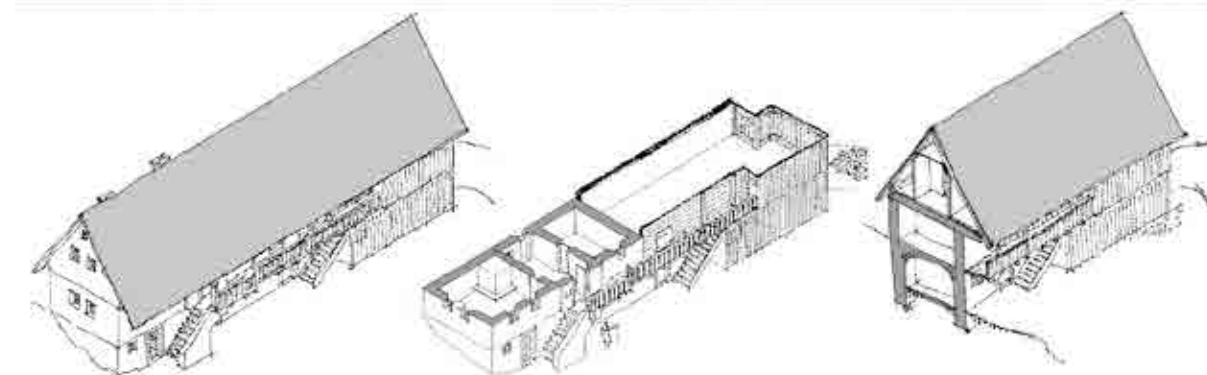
A house can be presented in a photo as we see it, but only technical drawings with exact dimensions can bring the real picture. © Author
